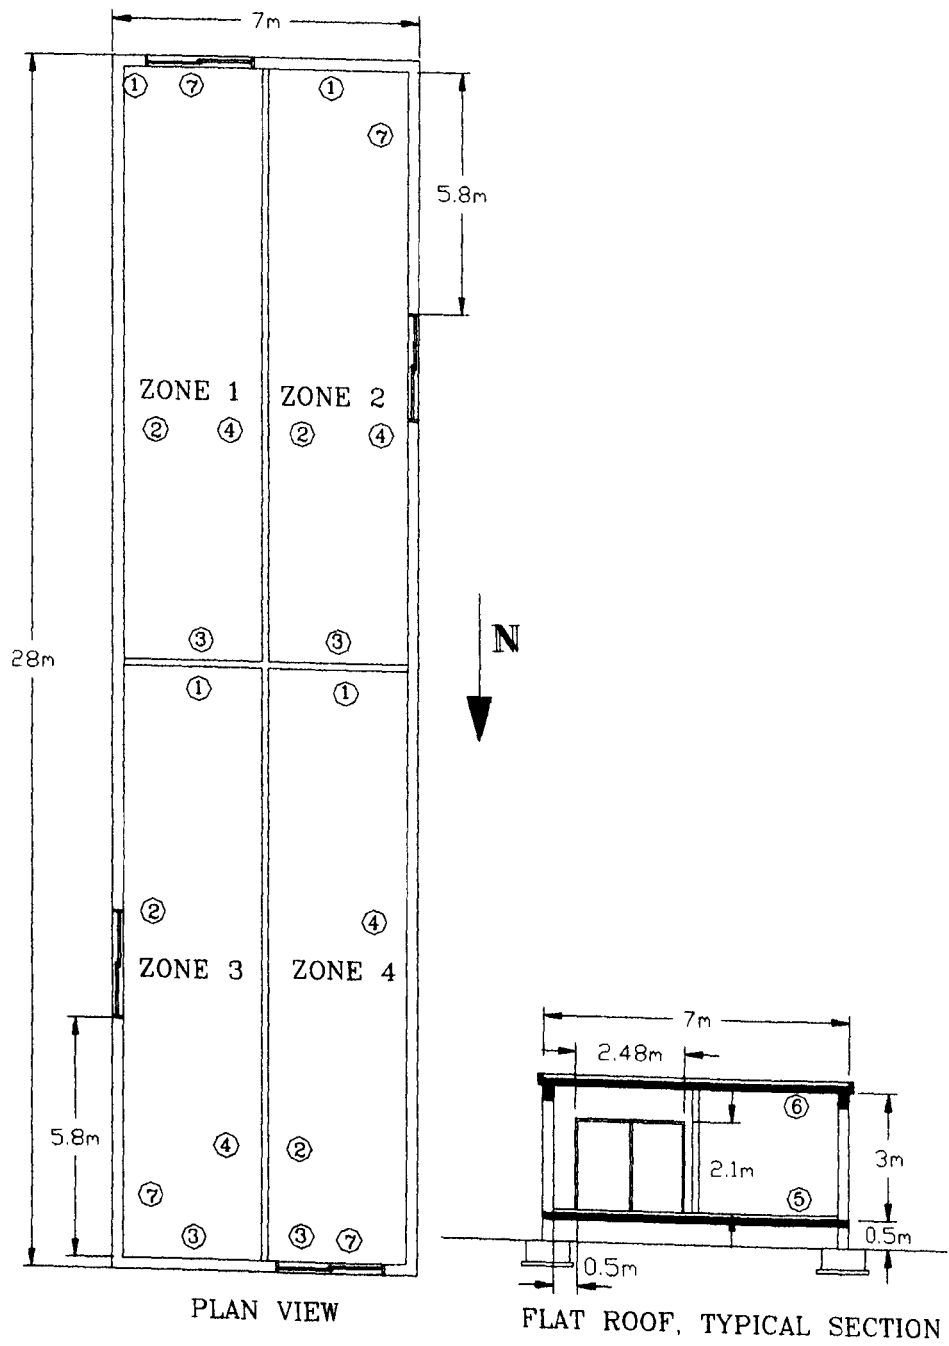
Model house Shape 2, with glass doors and changed dimension but with the same floor area and volume.
